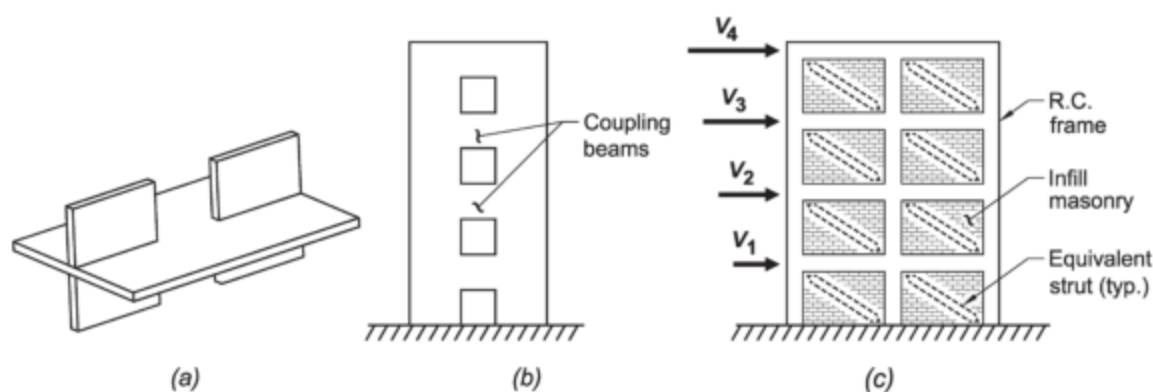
Coupled and infill walls: (a) shallow coupling beams or slabs; (b) coupling beams; and (c) infill walls.
